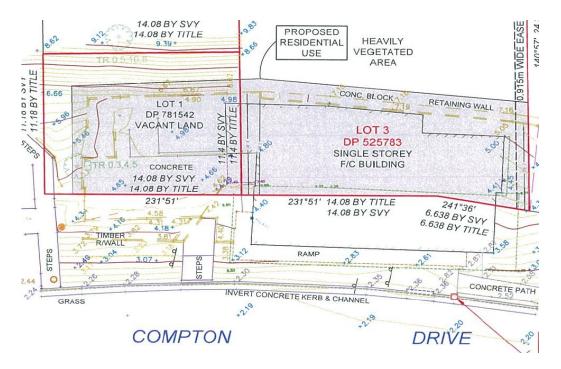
April 2020 survey plan extract showing proponent's requested rezoning area
